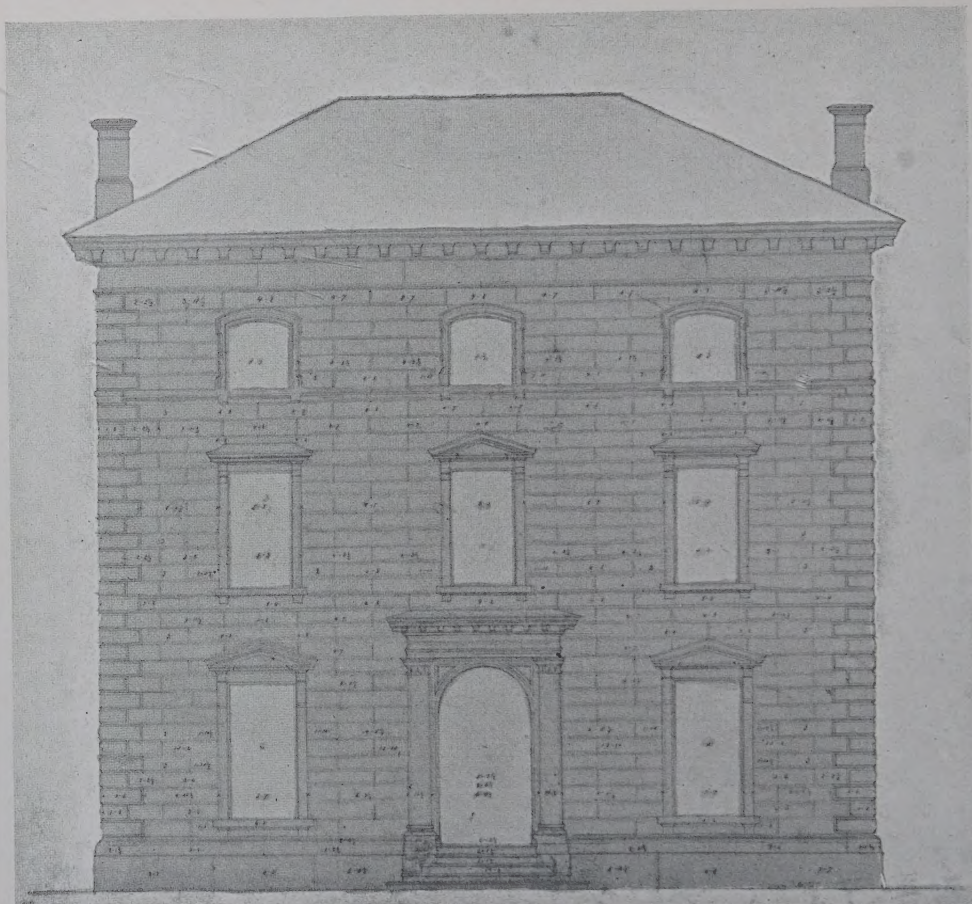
Working drawing for the facade of the Tully Bowen House.
